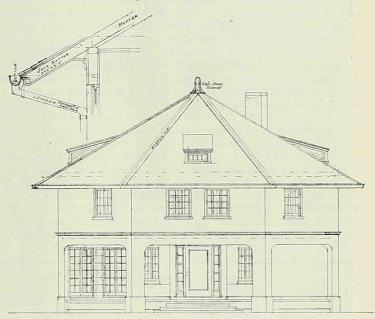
FRONT ELEVATION OF HOUSE FOR MR. FRANK VERNON.
